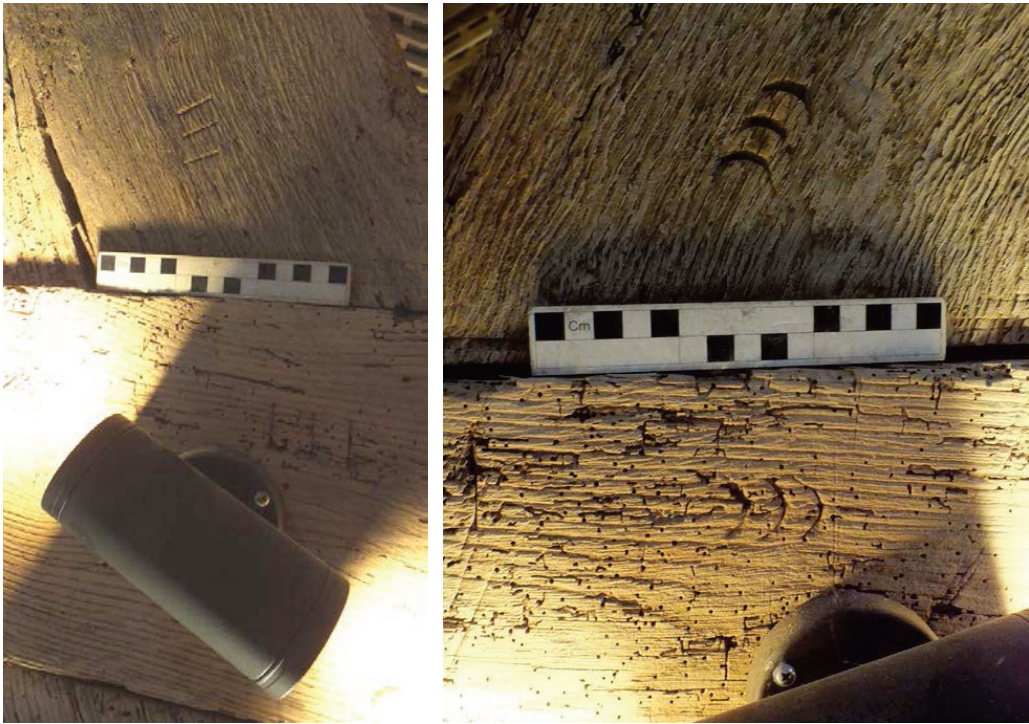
(left): Carpenter's mark 'III' on the east side of the north face of Truss 3, Room 2
